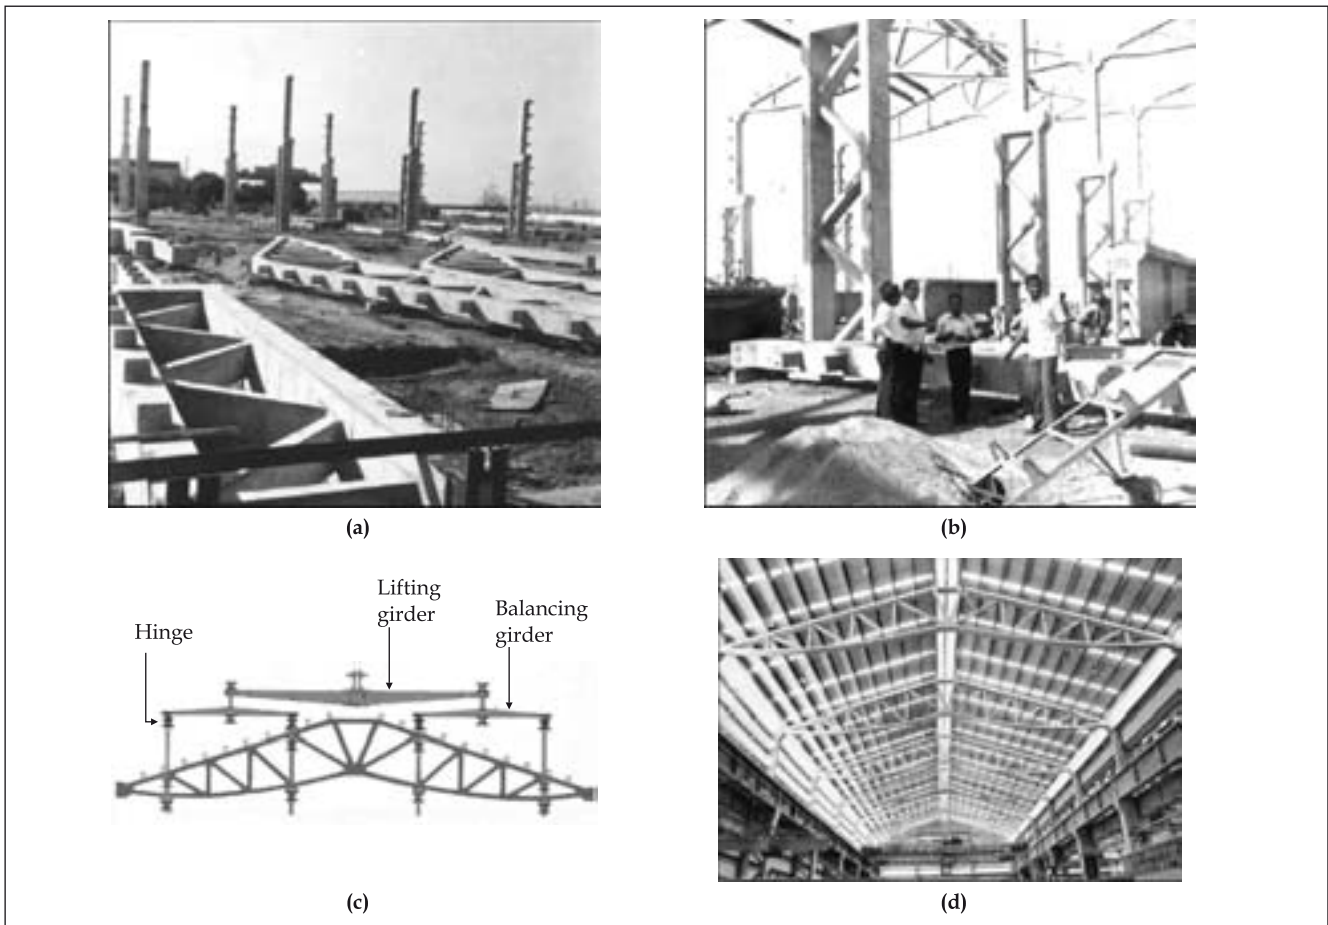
(a) Precast columns and trusses (b) Erection of columns and trusses in progress (c) Tilting and lifting arrangement of trusses (d) Finished view of one of the 30 m bays (BHEL, Hyderabad - 1982)
